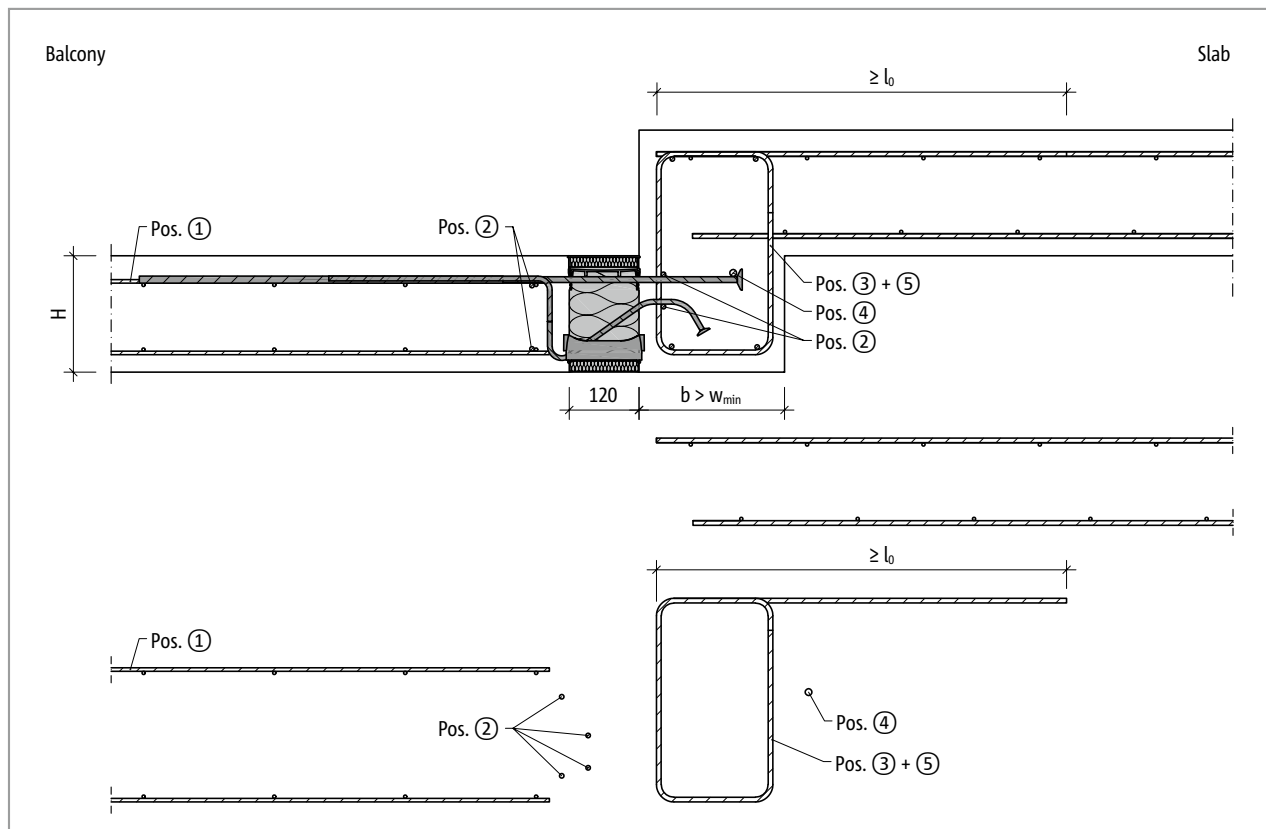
Schöck Isokorb® XT type K-U: On-site reinforcement for balcony with height offset downwards with larger structural element dimension ( $w_{vorh} > w_{min}$ )
